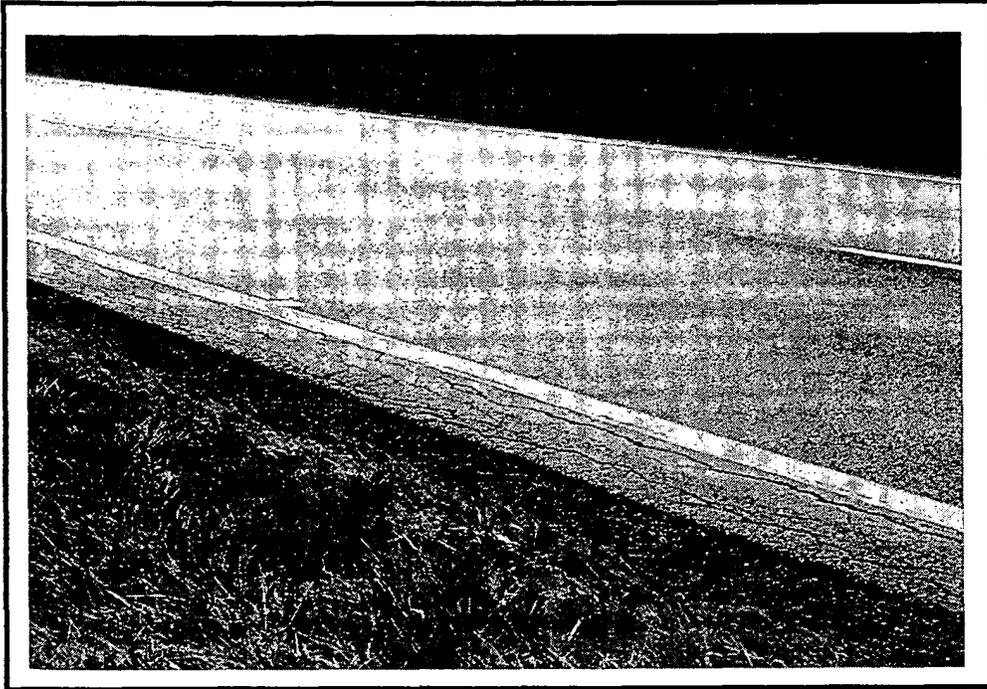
Edge Cracking in Flexible Pavement, Medium Severity
